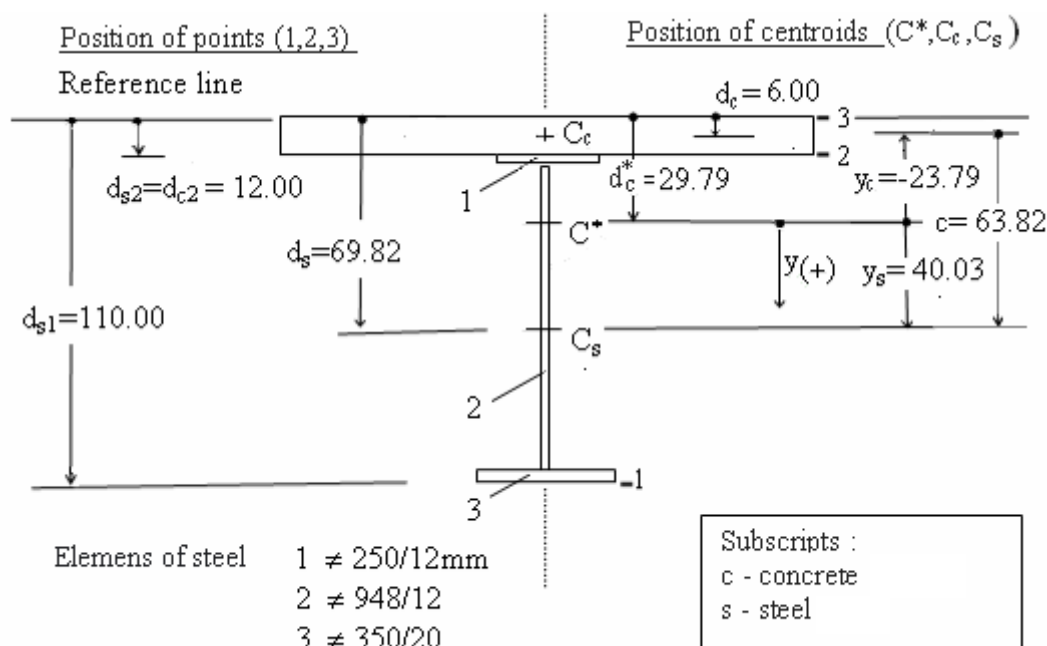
Cross section of girder and positions of the center of gravity of steel and concrete
